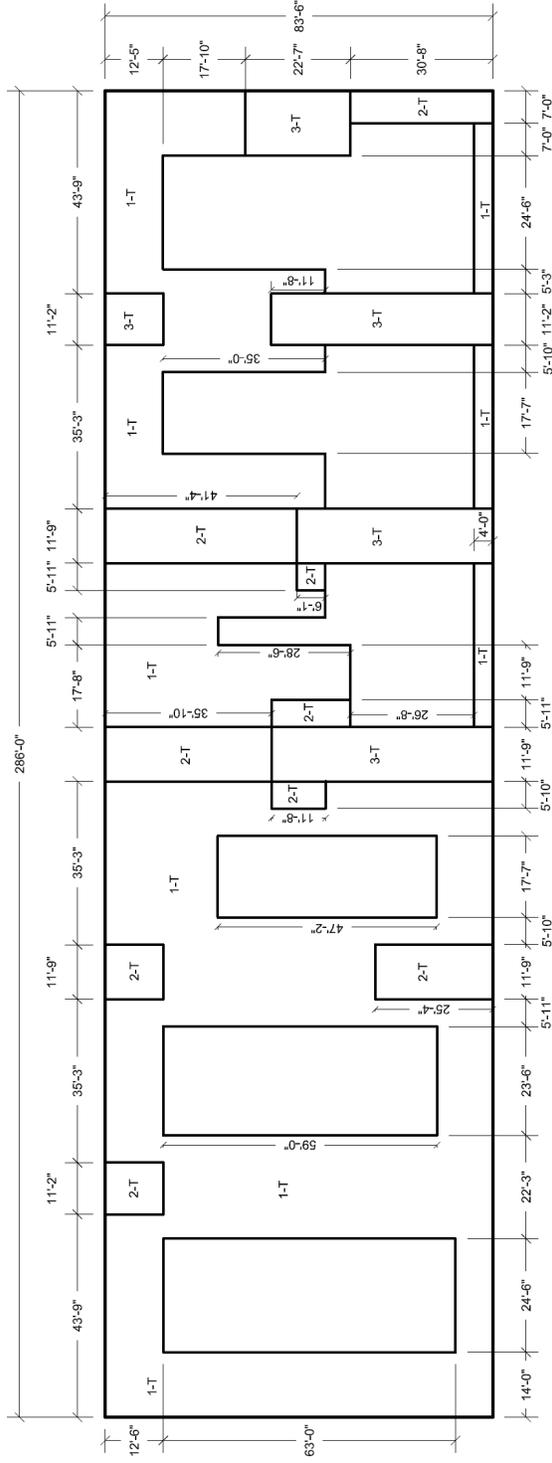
H.6-35: UHS BASIN NORTH WALL LOOKING SOUTH
